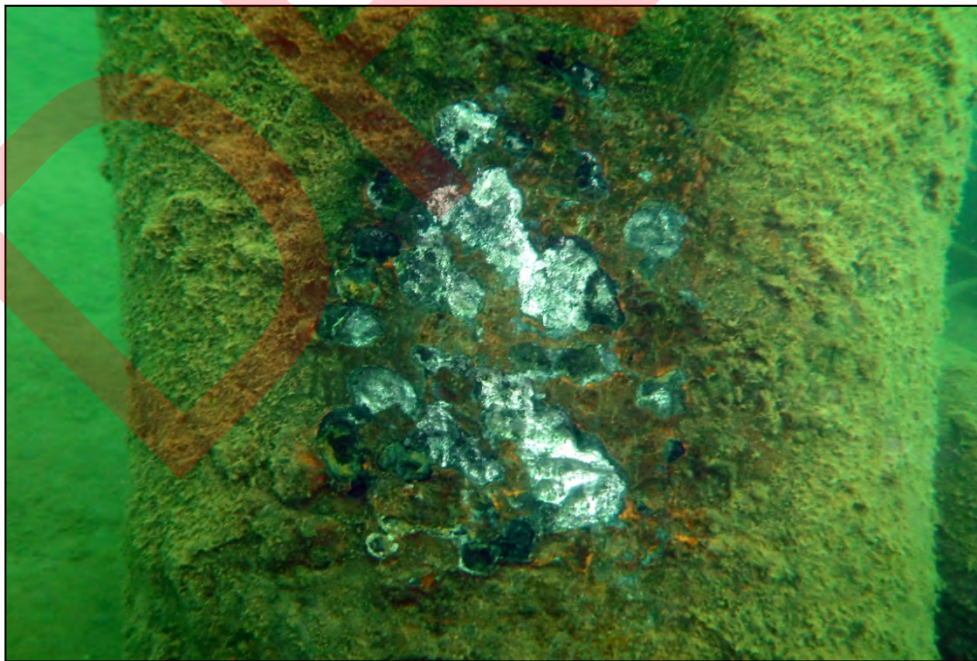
View of Broken Horizontal Brace Connection at Bent 16, Looking Northeast.
